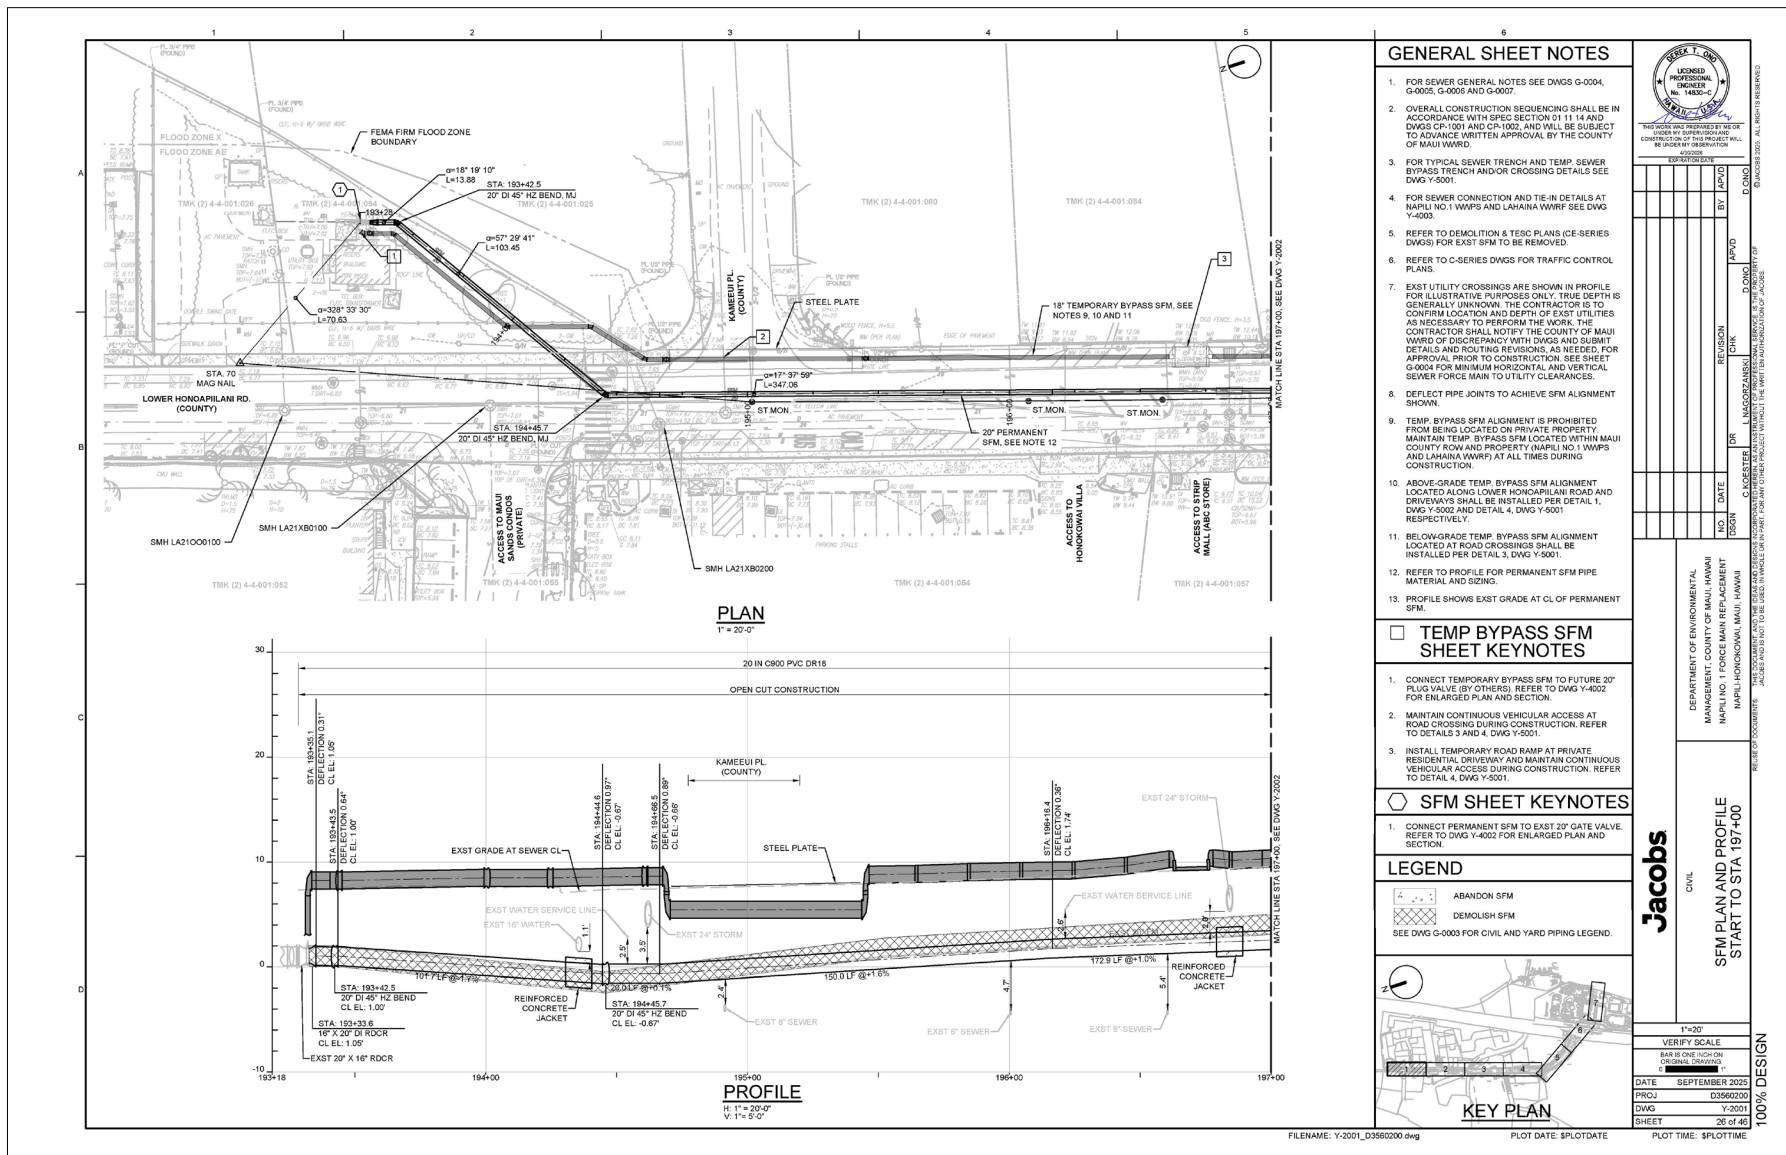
Segment 1 of the Sewer Force Main (SFM) plan and profile.
